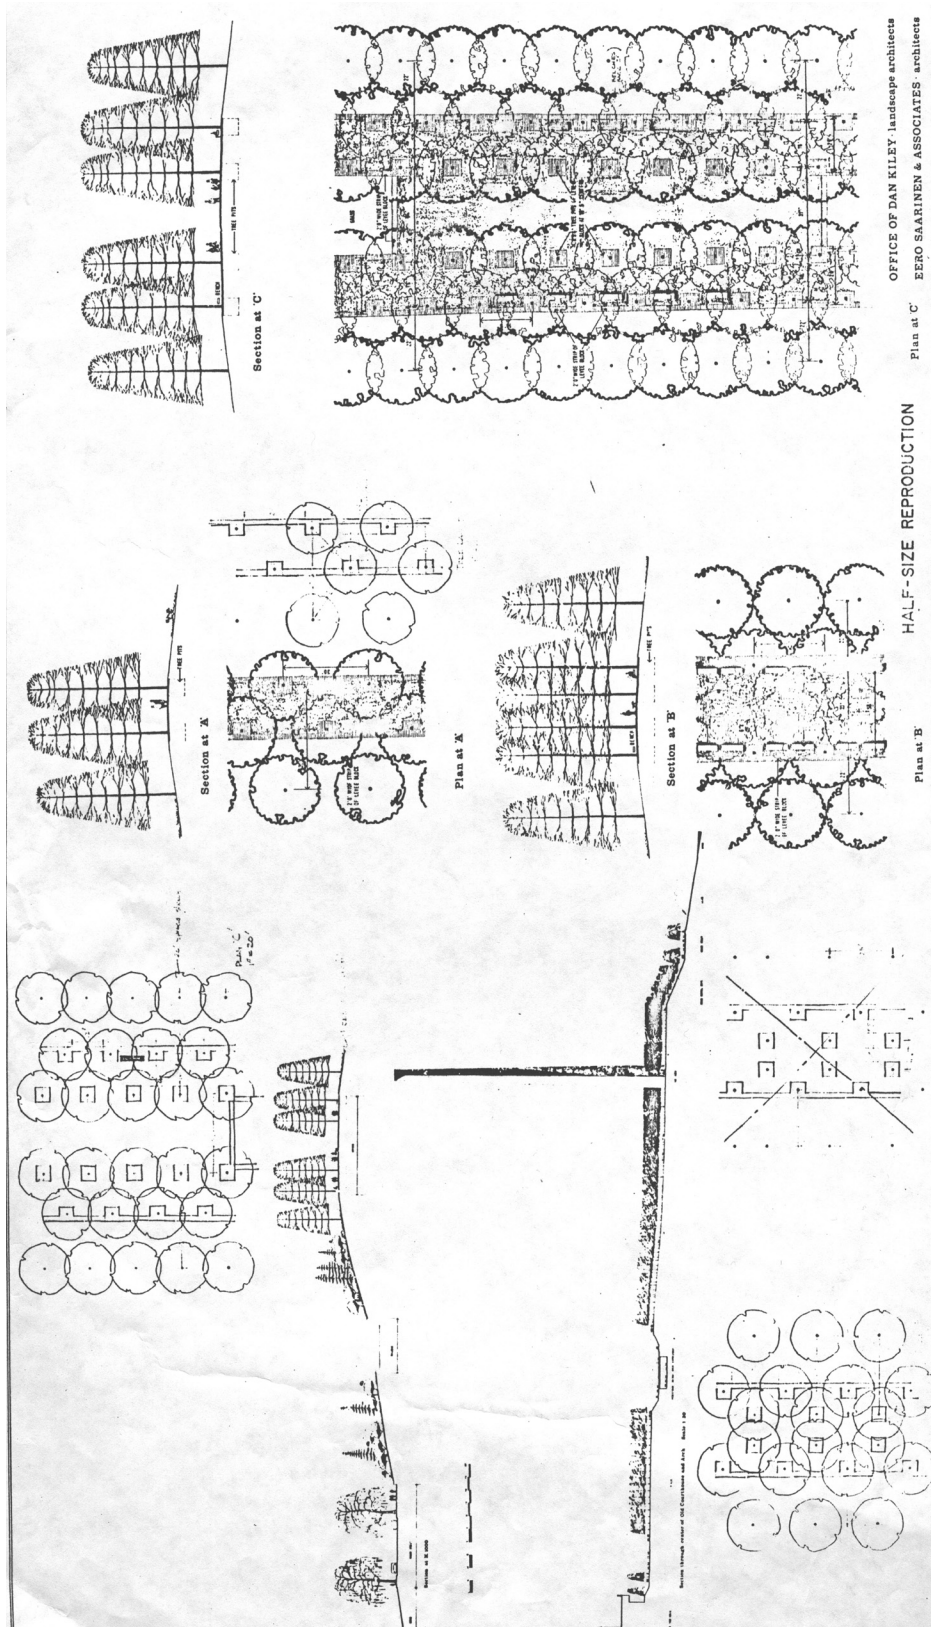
Office of Dan Kiley, section and plan details of walks and tulip poplar plantings, design development drawing, March 1963. (NEM Archives, uncatalogued collection)
